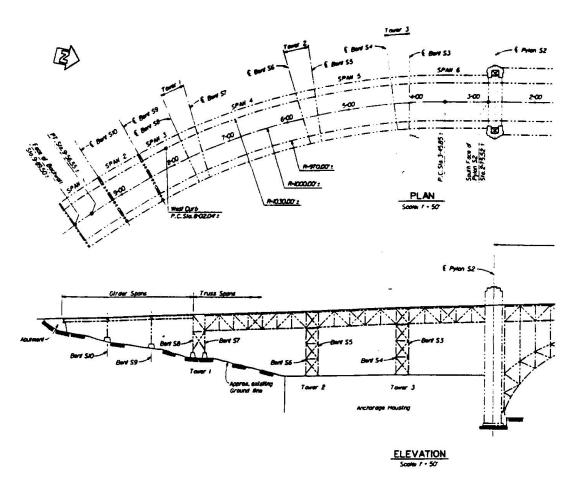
SOUTH VIADUCT GENERAL PLAN
